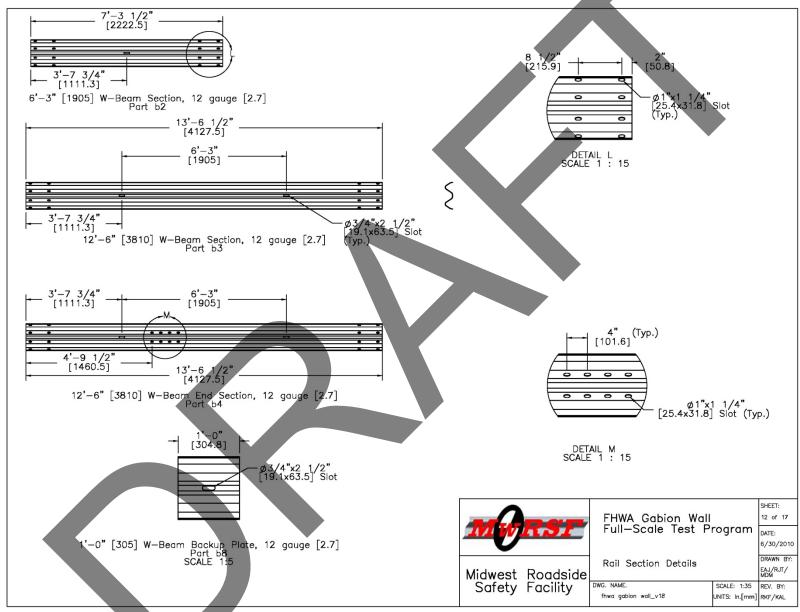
Schematic. Rail Section Details, Test Nos. MGSGW-1 and MGSGW-2.
